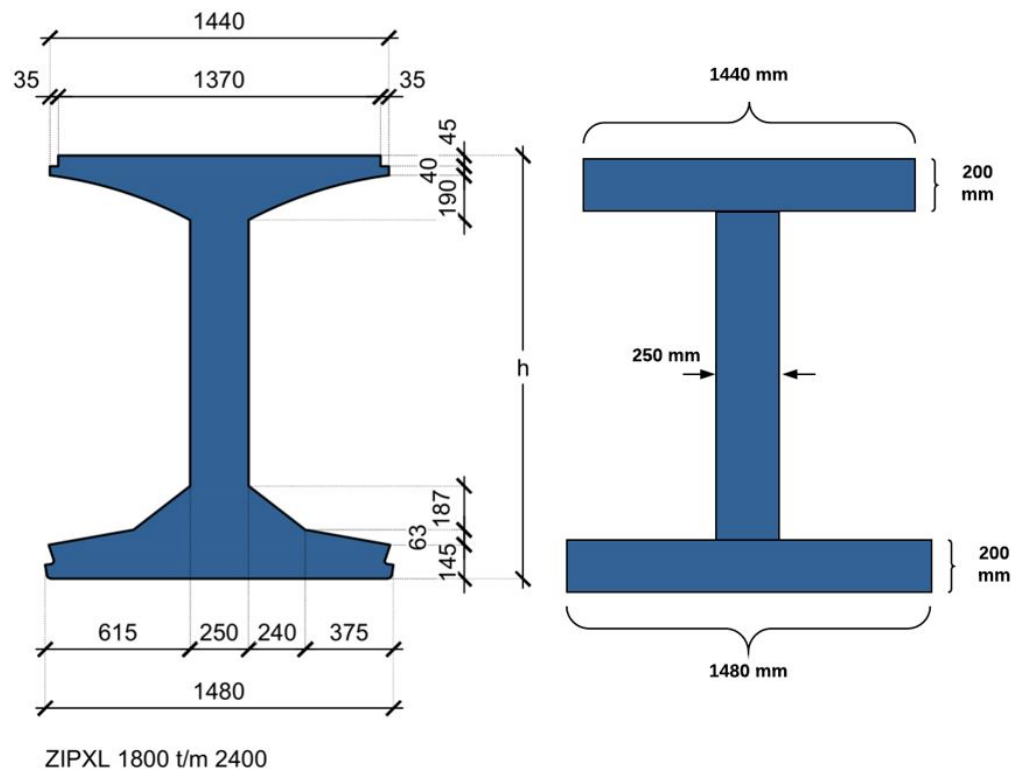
Cross-sections ZIPXL beams for the approach bridge, real and simplified. Source: Spanbeton
